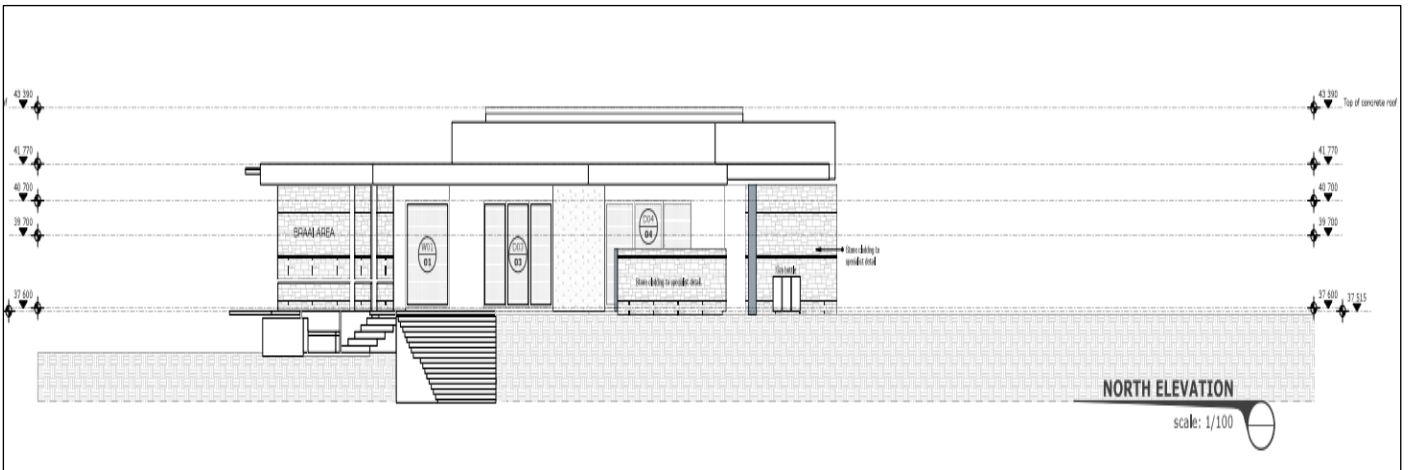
North elevation of the proposed entertainment facility (TMBA, 2018)
